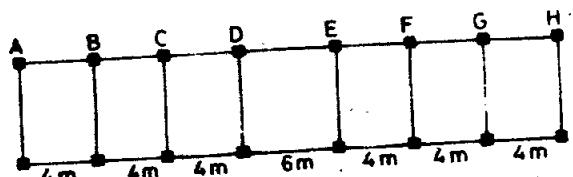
(a) Introduction of Discontinuity in a long unequal span continuous beam
